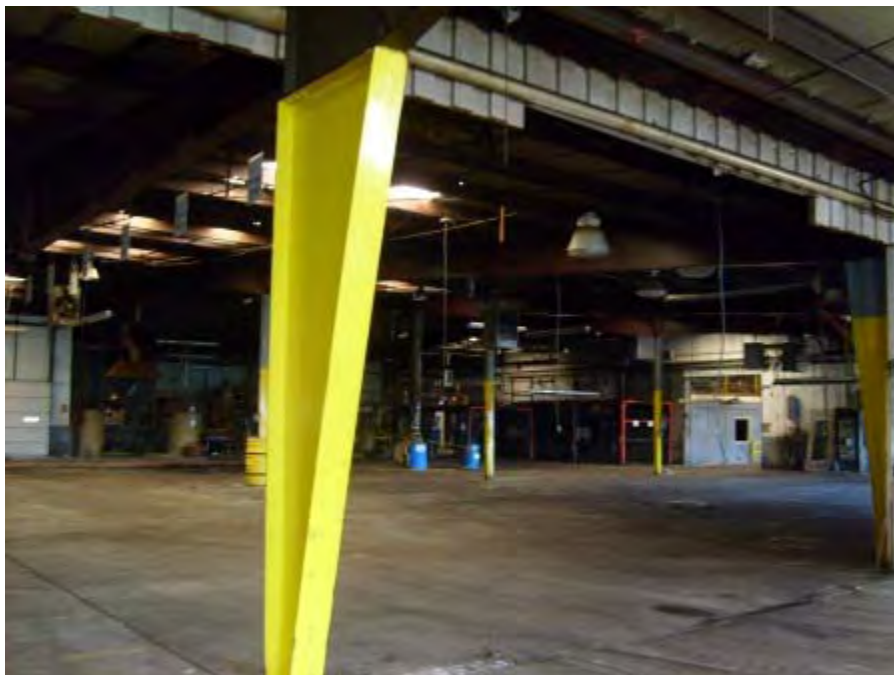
View of the central portion of the manufacturing floor area from the storage room area.
